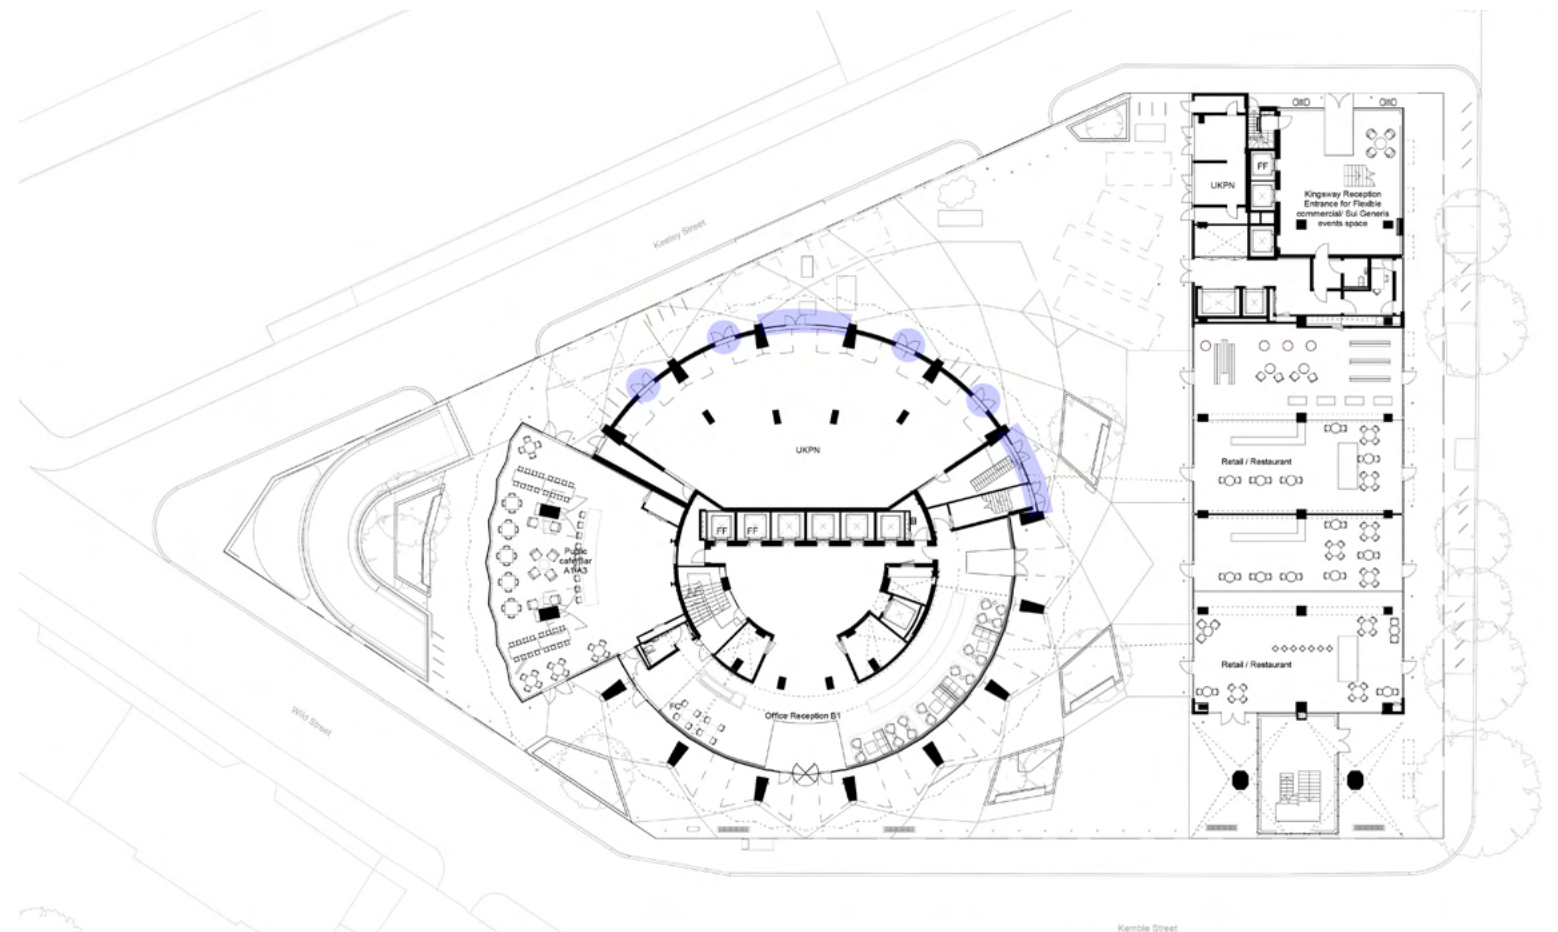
Ground Floor Plan - MAT 10 location
